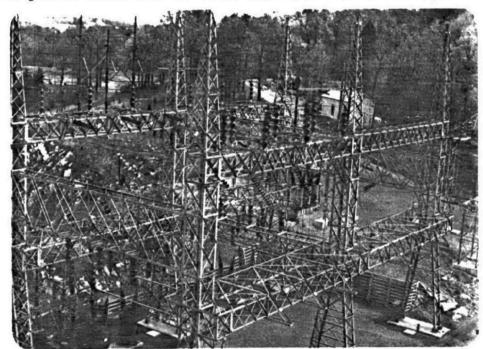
View from rooftop facing northeast showing electrical substation serving the plant.
